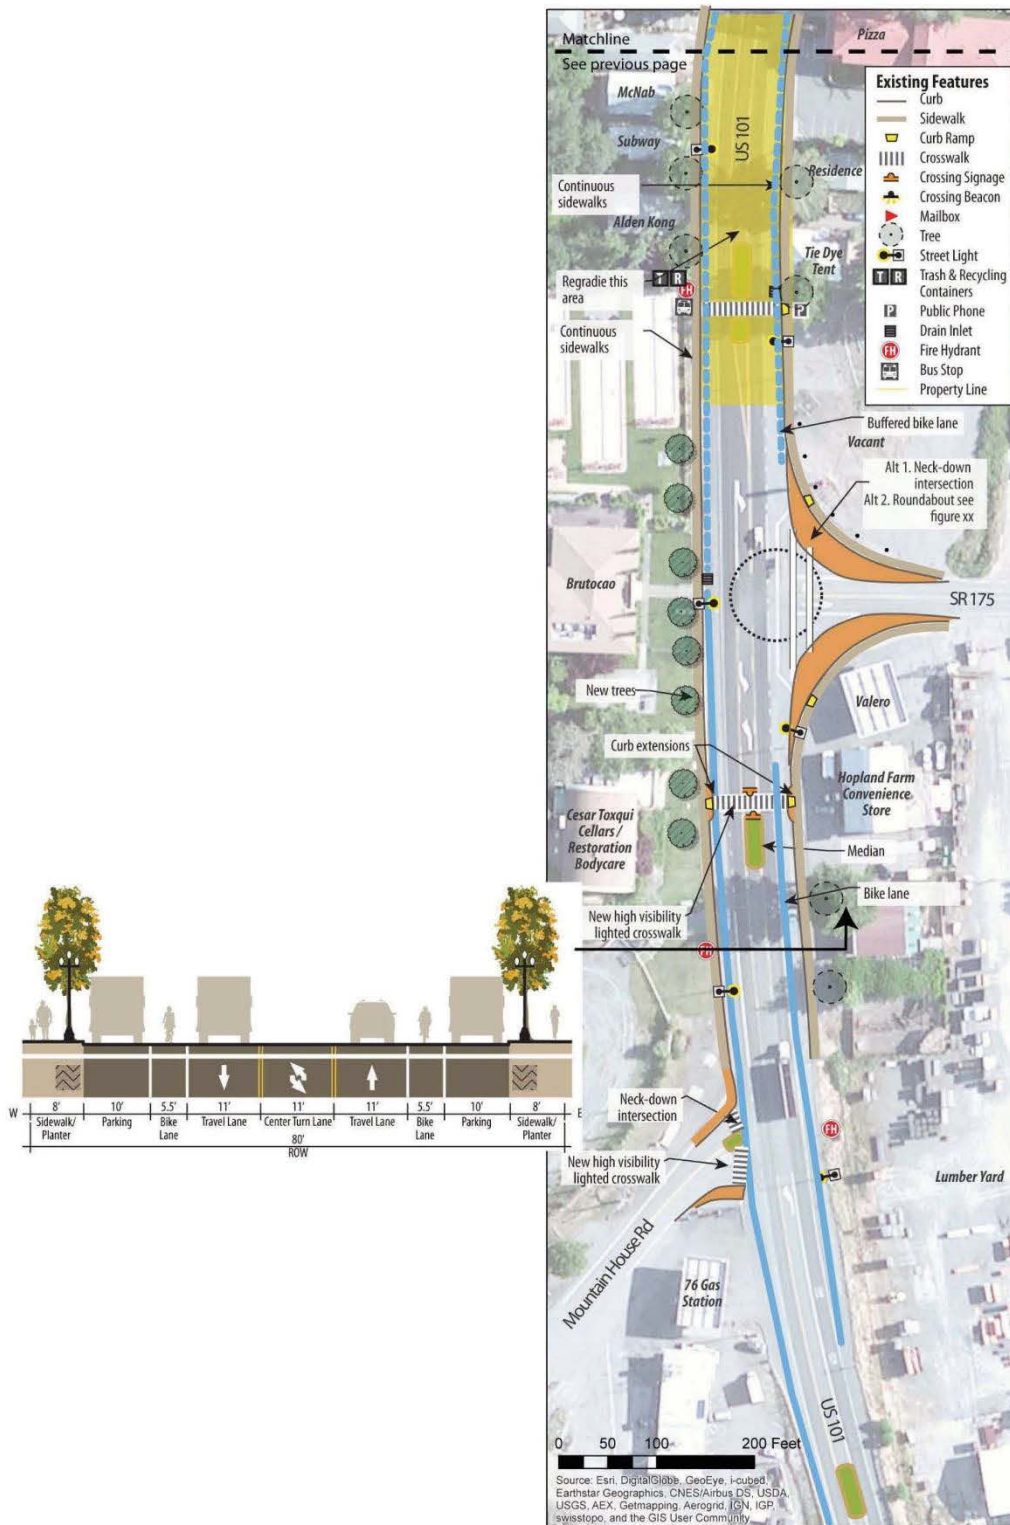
Proposed Improvements (Source: North Hopland, from Main Street Corridor Engineered Feasibility Study)
